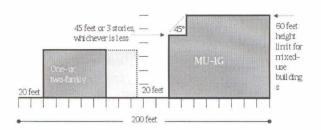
MU-1G Supplemental Building Setback and Transitional Height Plane (Popup full image)
